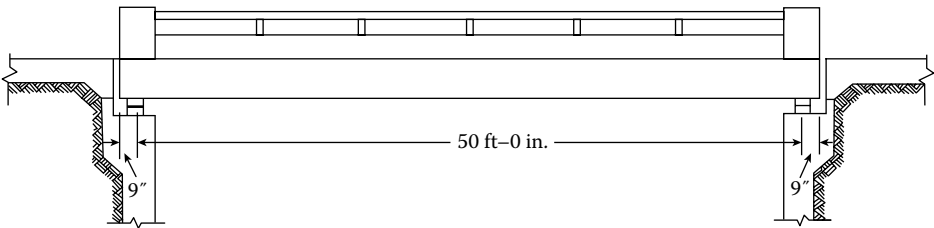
Elevation of T-beam bridge of Example 5.2.
